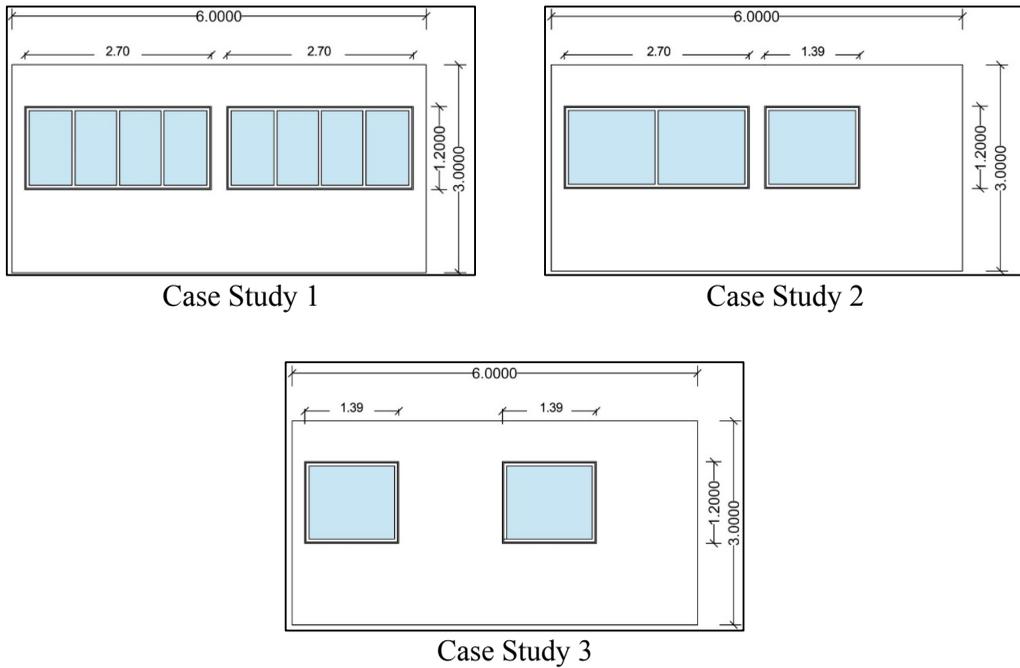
Apartment Façades in the Case Studies 1, 2 and 3
